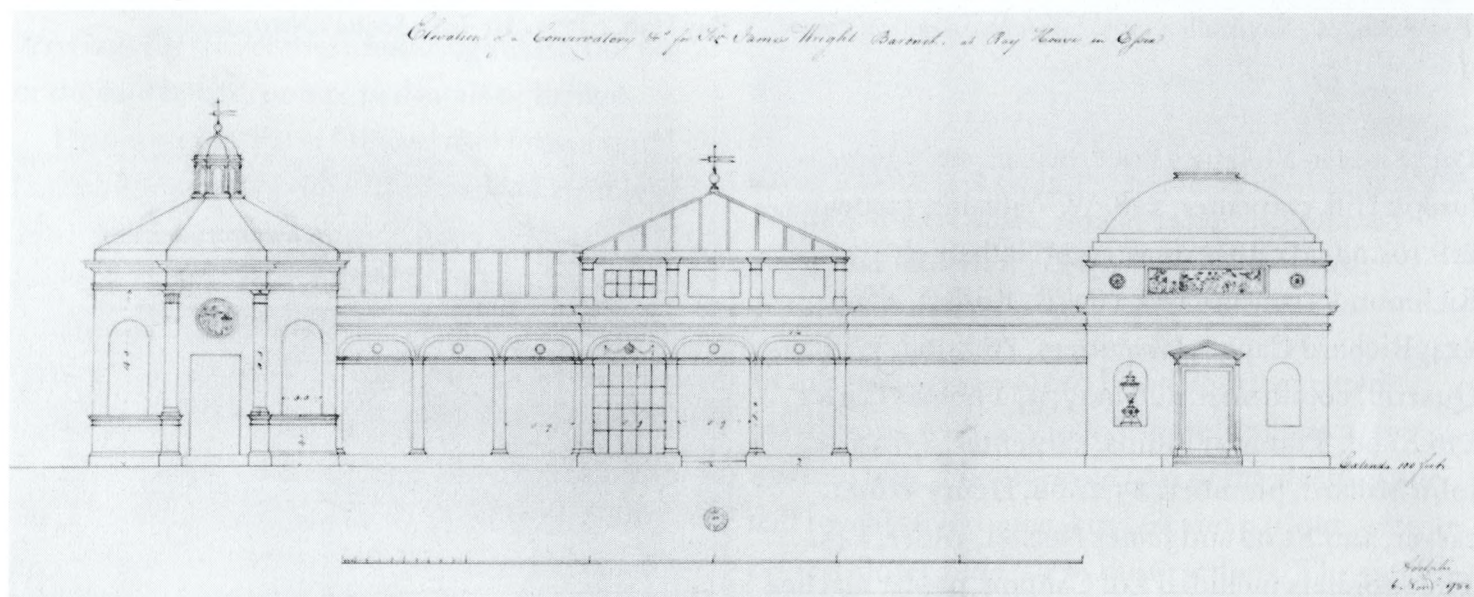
Robert Adam, elevation, proposed conservatory, Ray Hall, November 1782. *Sir John Soane's Museum*.
